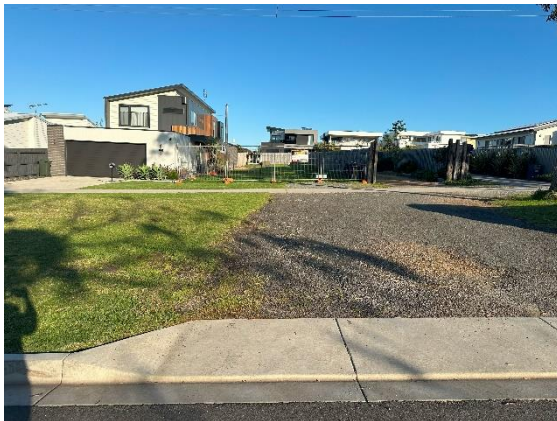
Subject site at 1/542A, Lake Tyers Beach Road, Lake Tyers.
